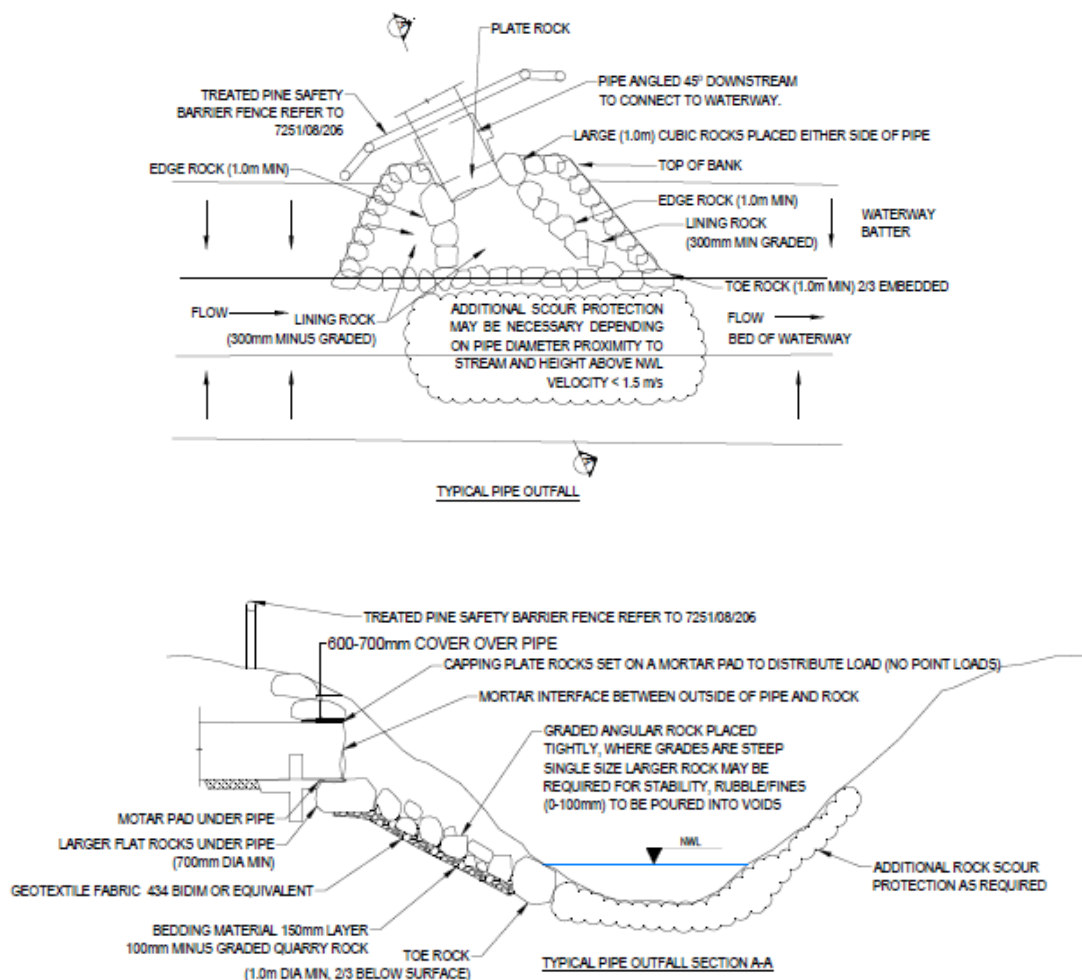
Typical rip rap scour protection apron detail (M.W.2019).
